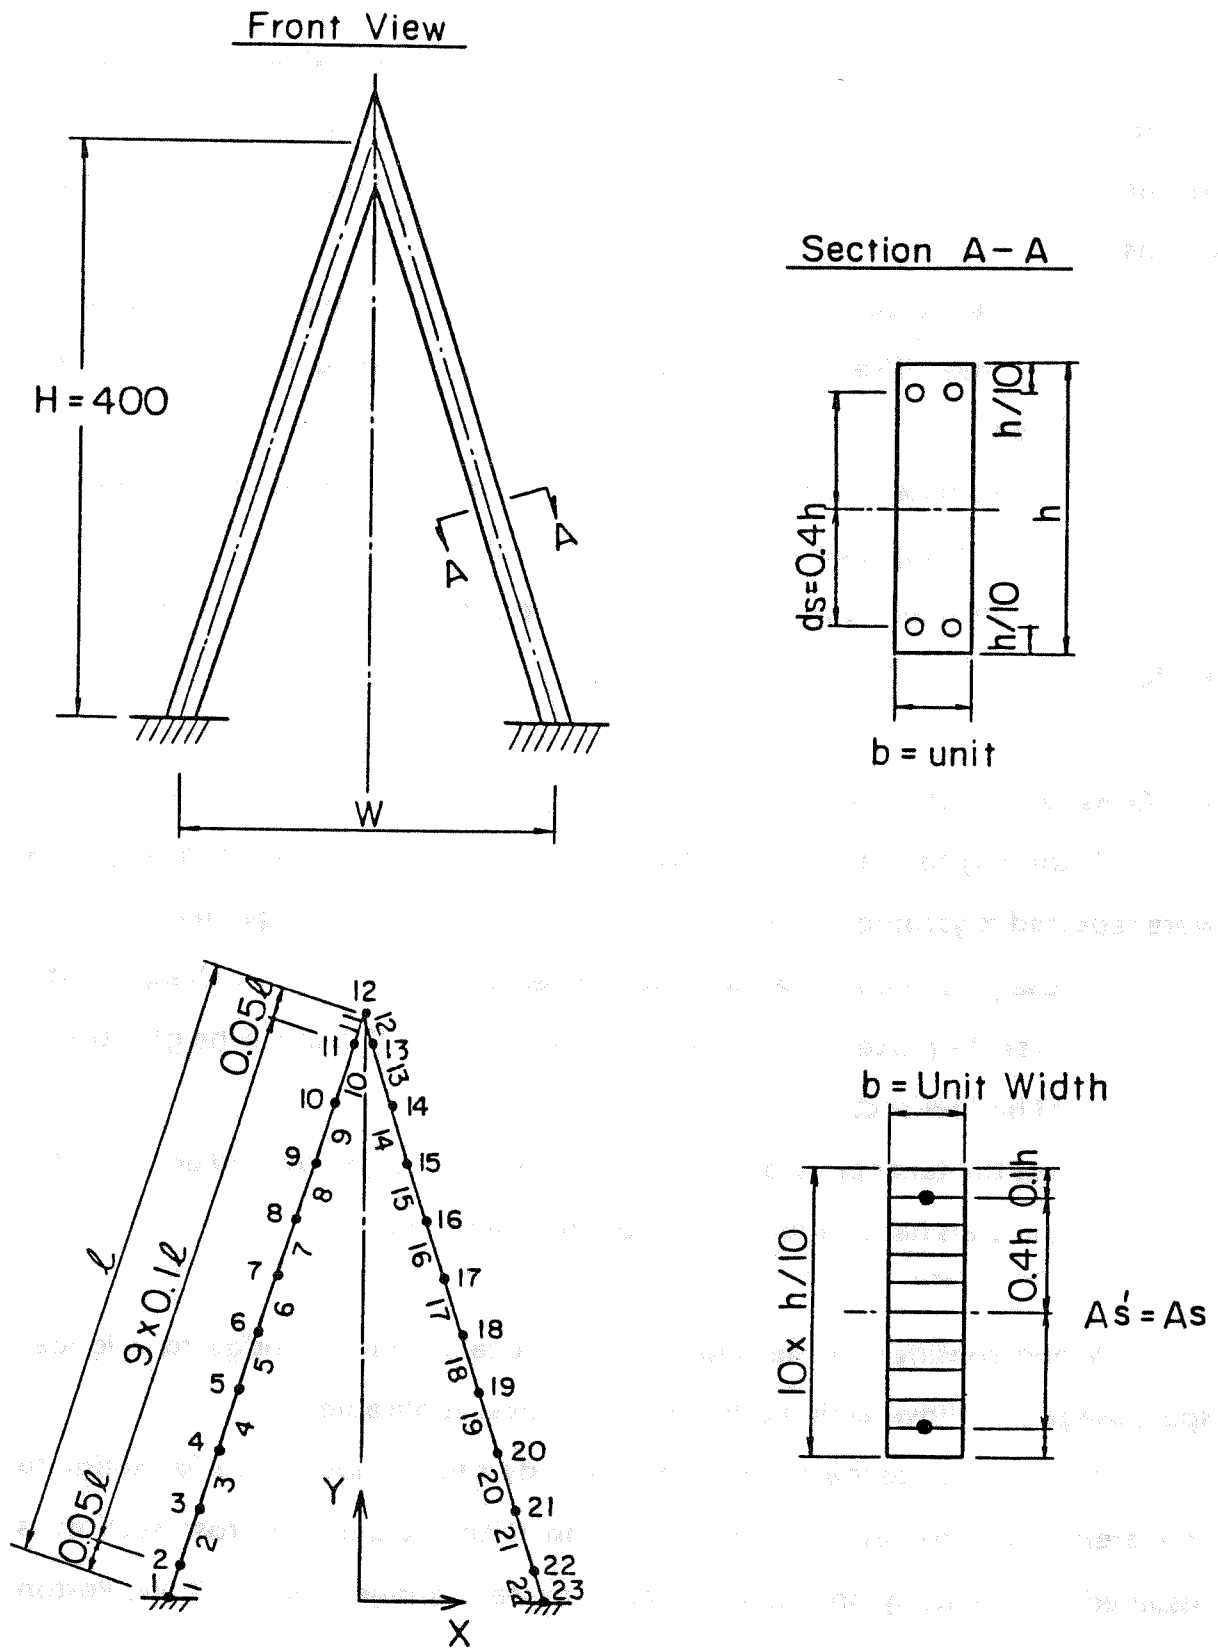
Modelling of A Shape Tower into Finite Elements and of Cross Section into Layers
